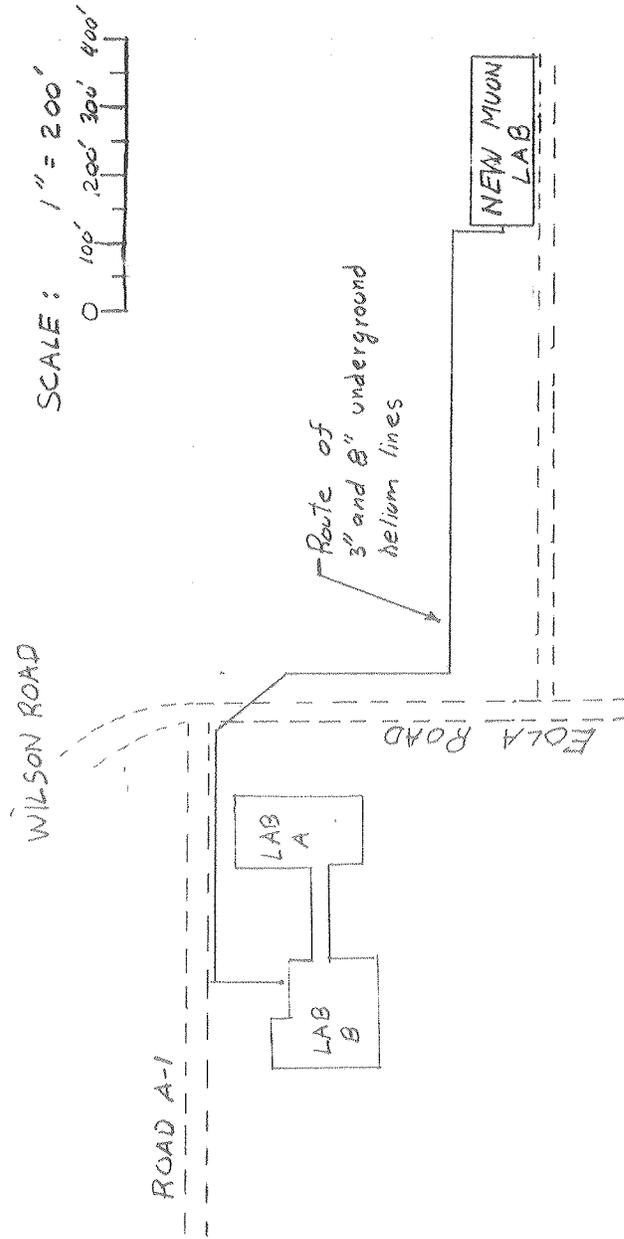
Piping Route. Extracted from Architectural Services Muon Laboratory Vicinity Plan and Drawing List, Drawing #8-2-76, C-2, Rev. 17.
